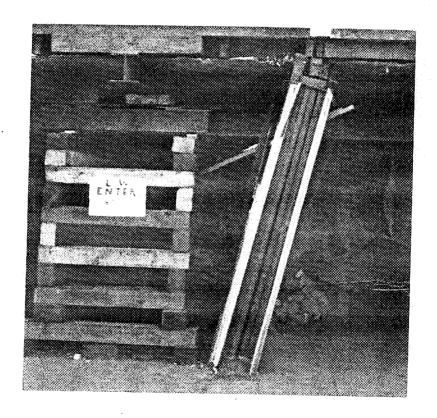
Inadequate connection between post and second floor framing in the corner 4-storey apartment building in Marina District, San Francisco
